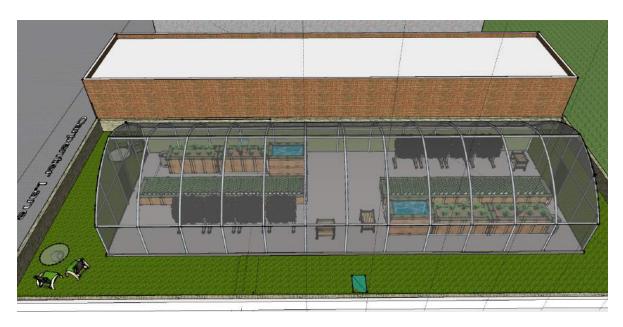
Carpenter Street Rooftop Greenhouse & Green Roof - Mt. Airy
